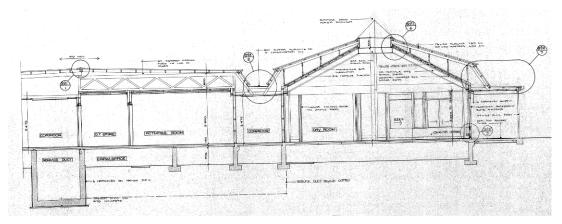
Spinal Injuries Unit – Plant Building Section
